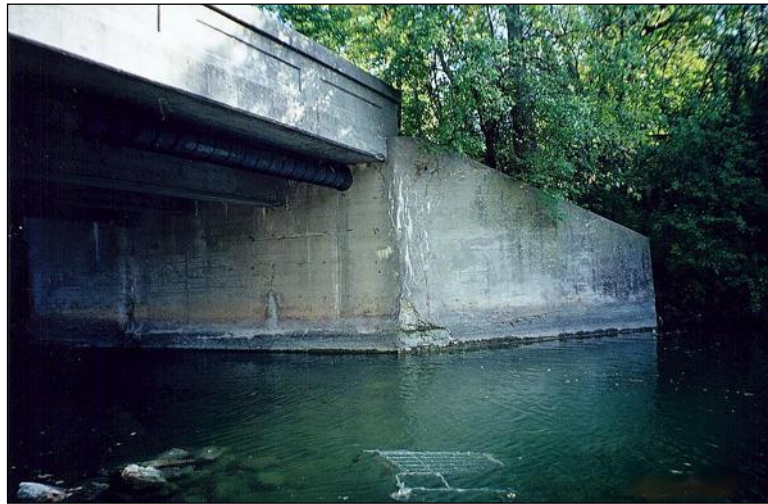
Reinforced Concrete Wingwall
